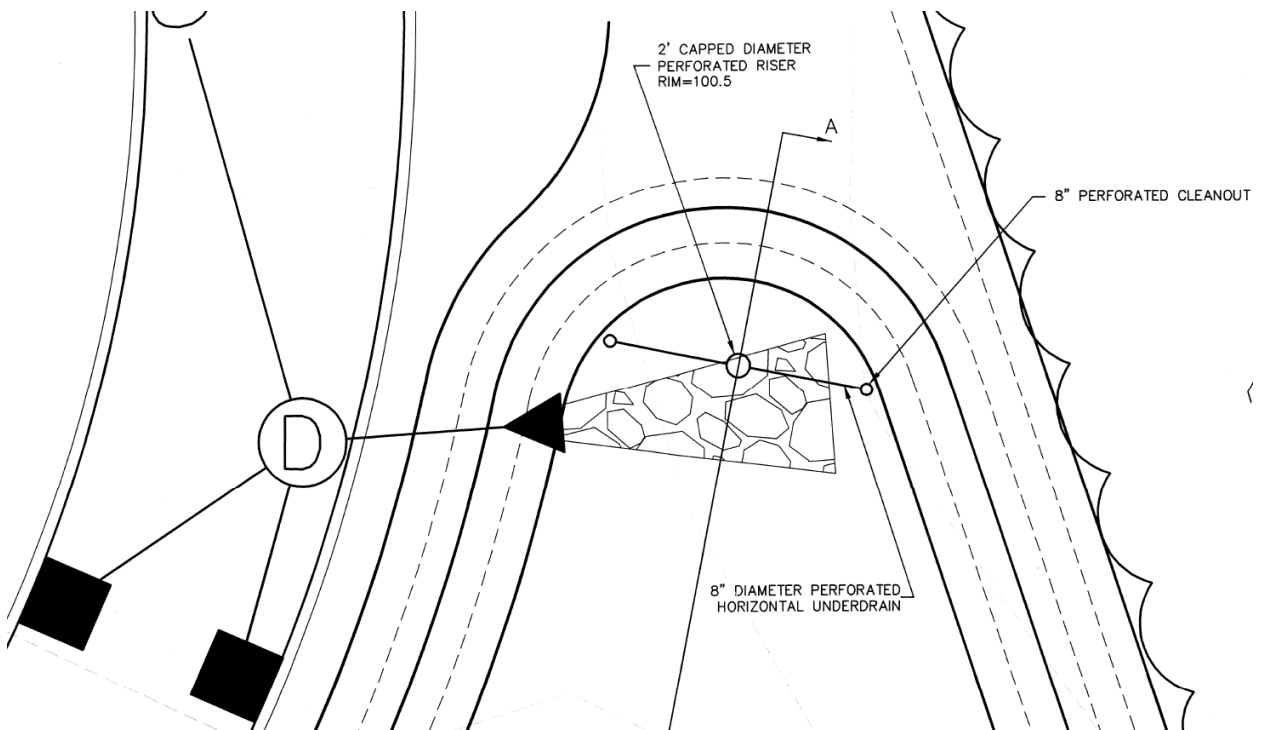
Typical plan view of multi-inlet configuration of a SGW system
